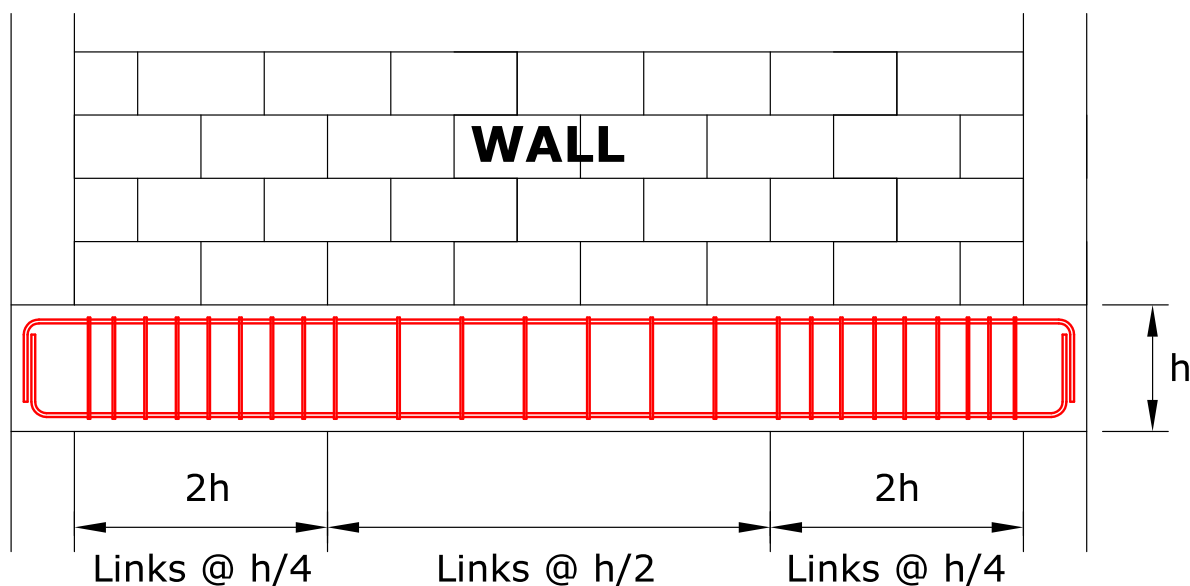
LINK SPACING FOR REINFORCED CONCRETE SUSPENDED BEAM
